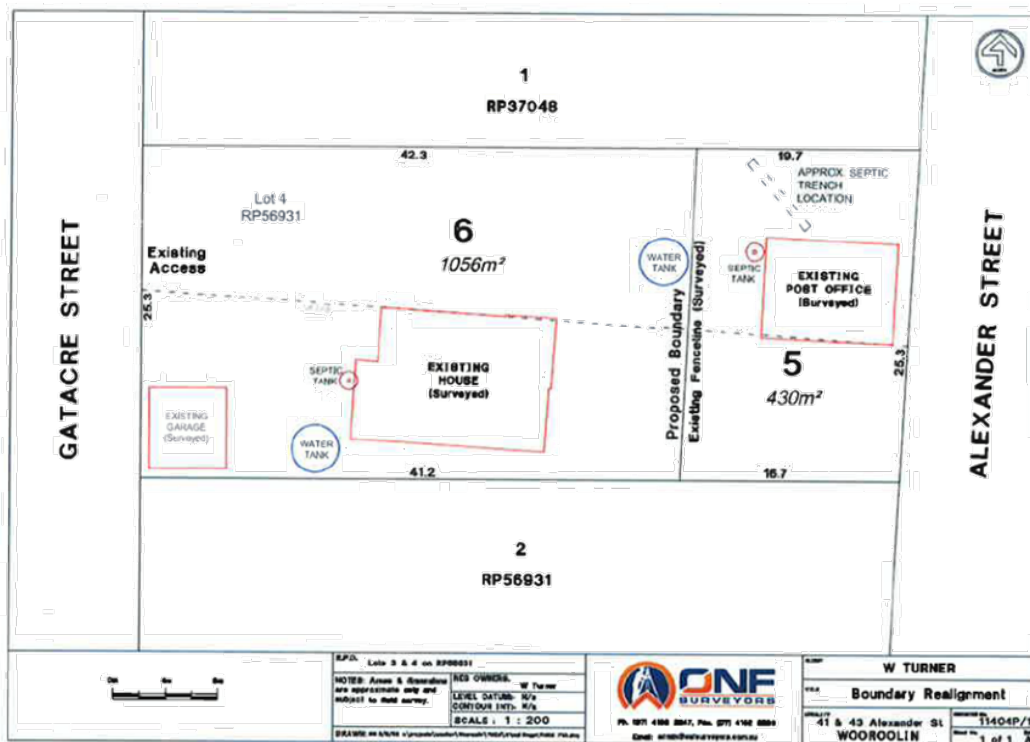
Proposed Boundary Realignment Plan (Source: ONF Surveyors).
